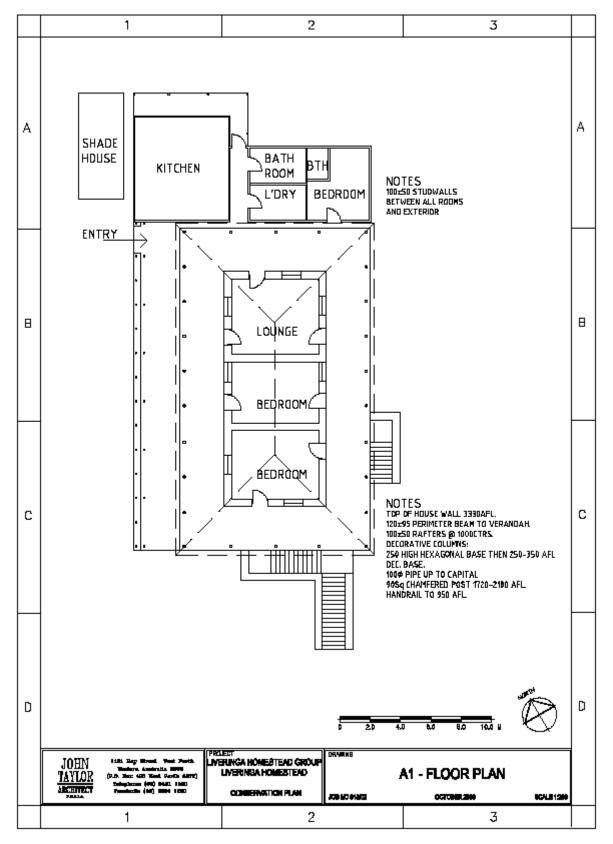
Floor Plan of Liveringa Homestead. (John Taylor Architect, October 2003; Conservation Plan of 2003, p. 78)
